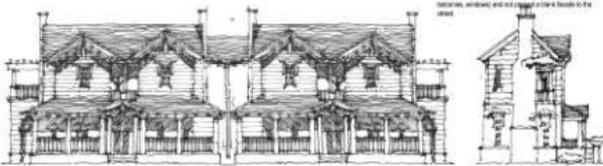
DESIGN PROTOTYPE: ATTACHED RESIDENTIAL
